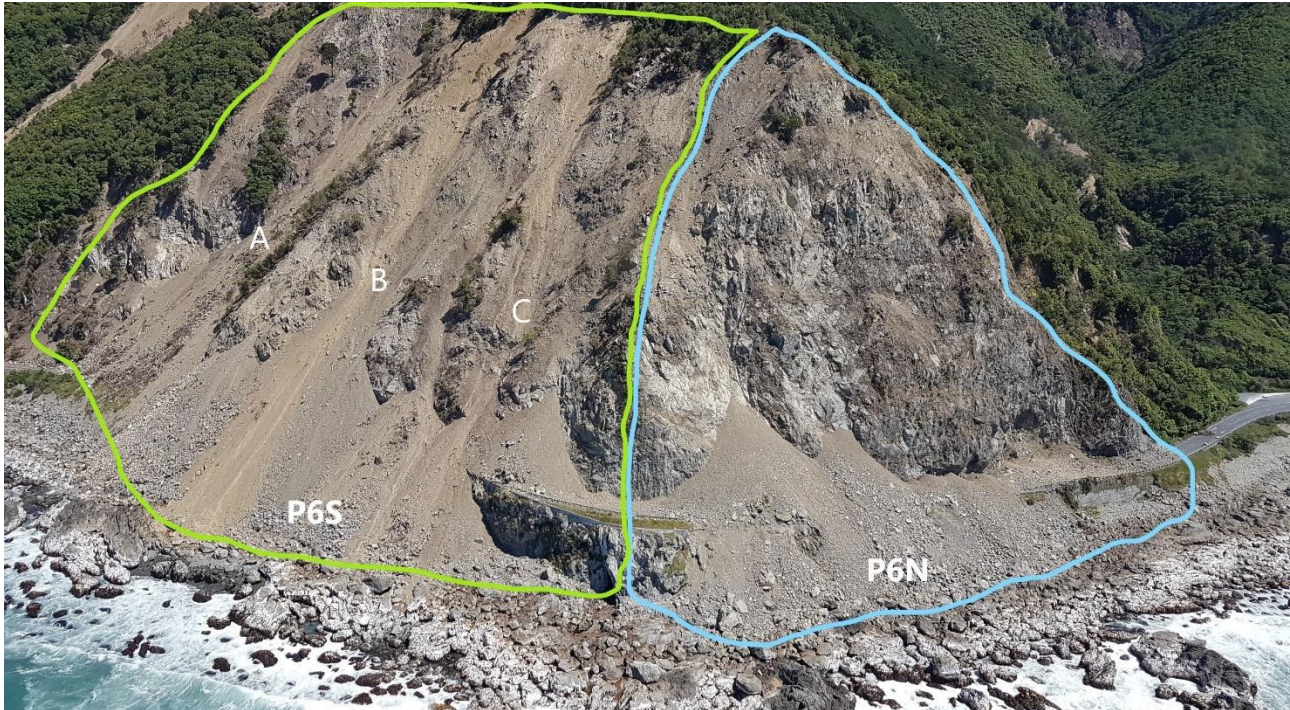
Site overview plan, [P6N] and [P6S] Ohau Point (post-earthquake image)
